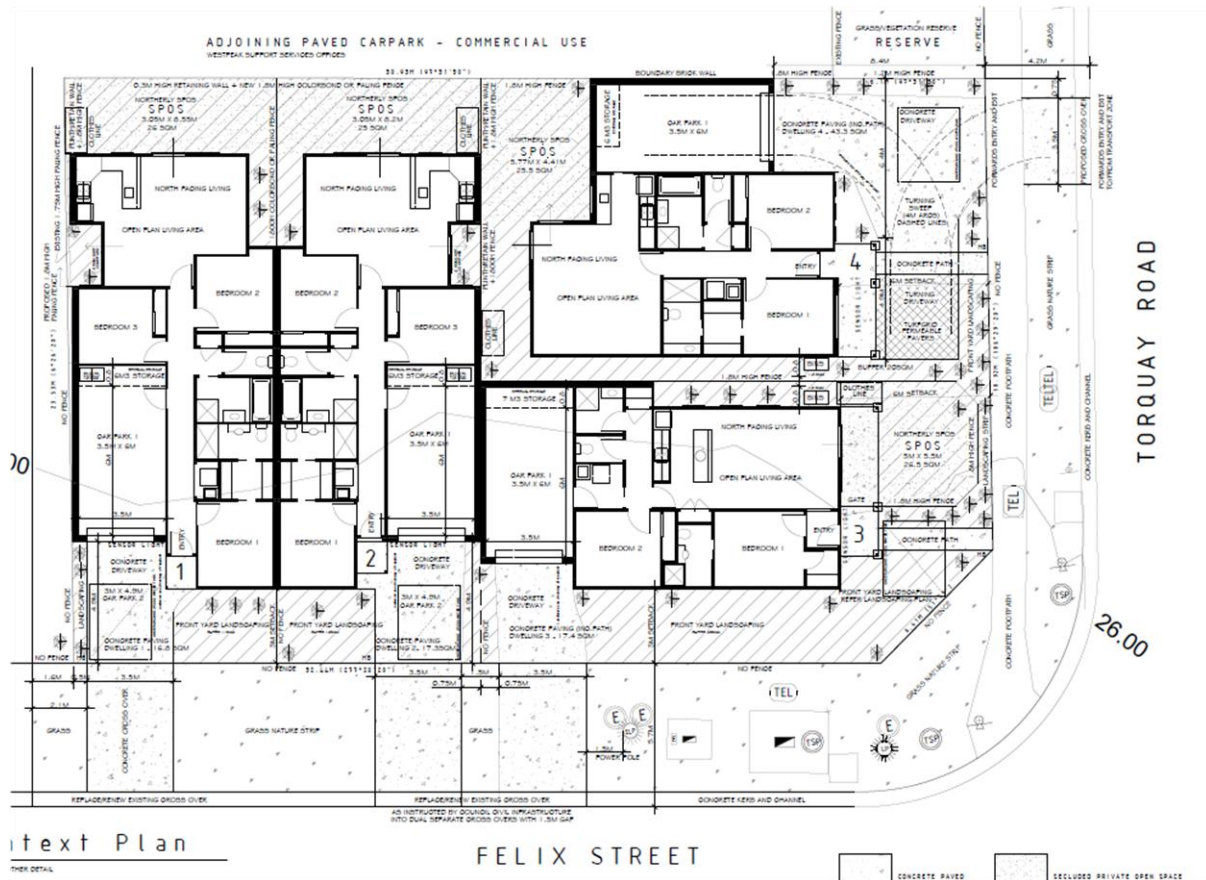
PROPOSED SITE PLAN (SOURCE: BELLARINE BUILDING DESIGN AND DRAFTING)
